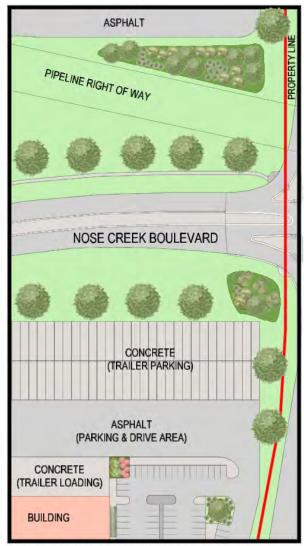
PEDESTRIAN CONNECTIONS, OPEN SPACE AND LANDSCAPING
